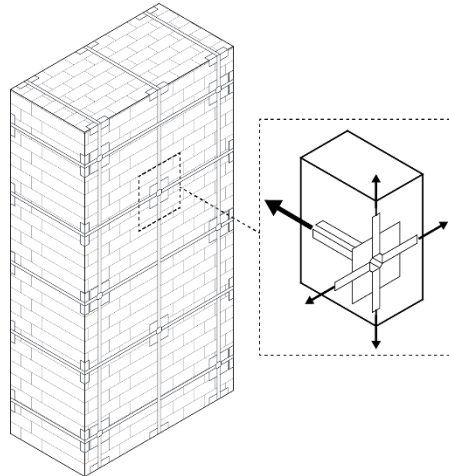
Example of application of the CAM[®] system on an existing masonry wall
